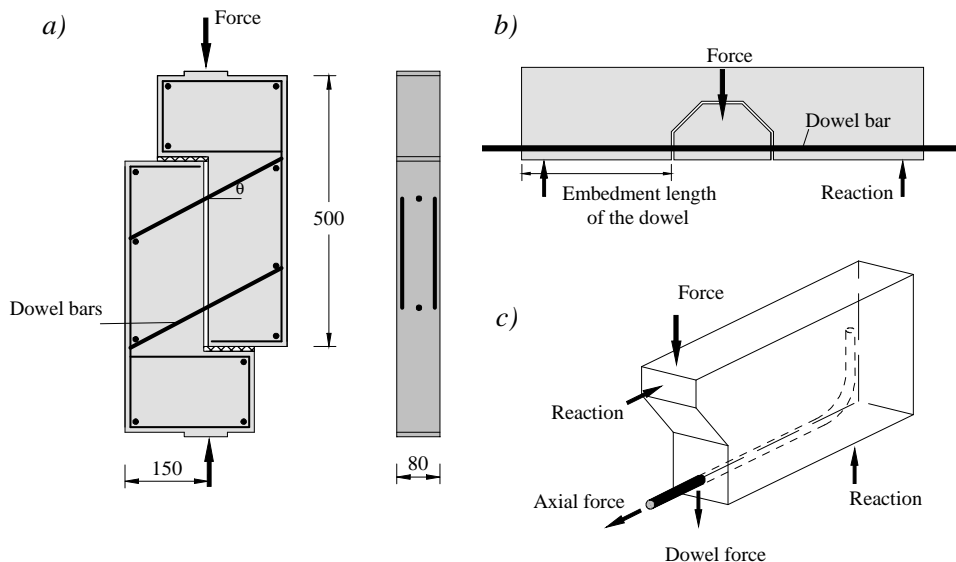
Dowel-action test setups: a) direct dowel test, b) divided beam test specimen, and c) beam-end test specimen
